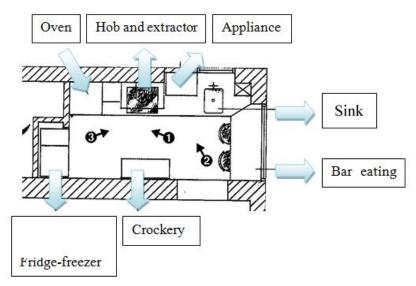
Small kitchen plan, internal room dimensions: 1.9m wide and 4.4 m long: (Grey, 1998)
